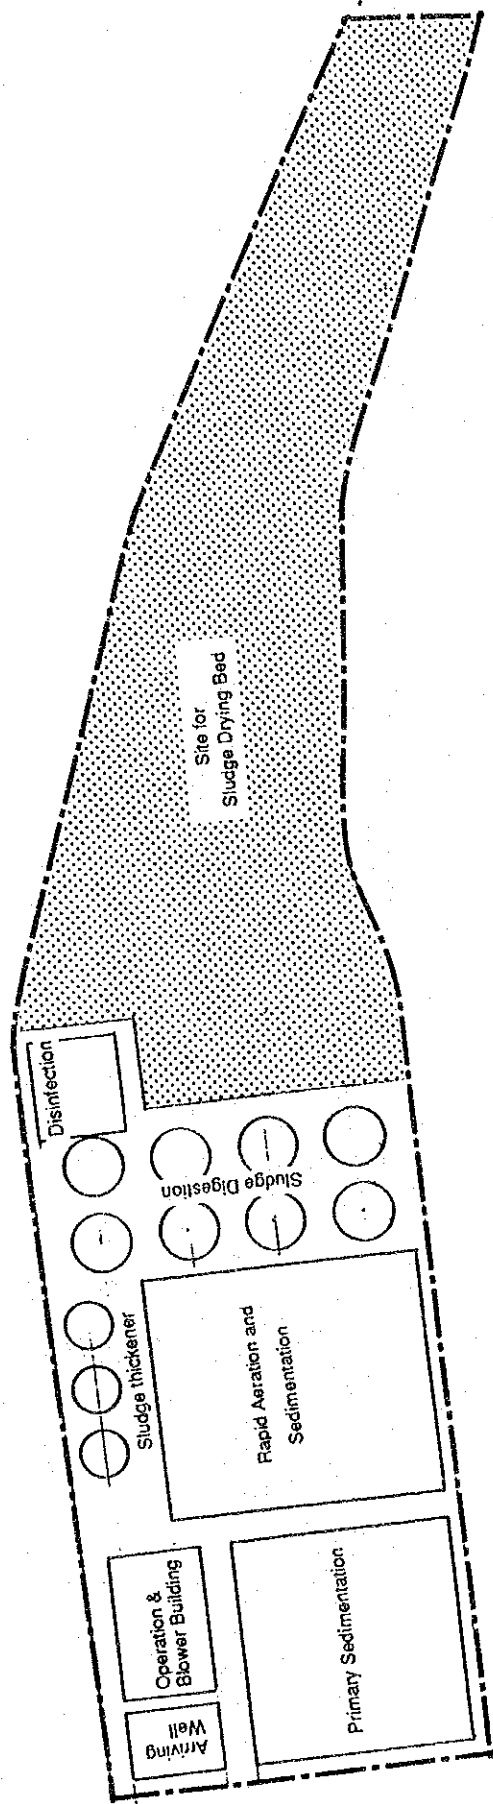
General Layout of Wastewater Treatment Plant (Irpavi Option)
